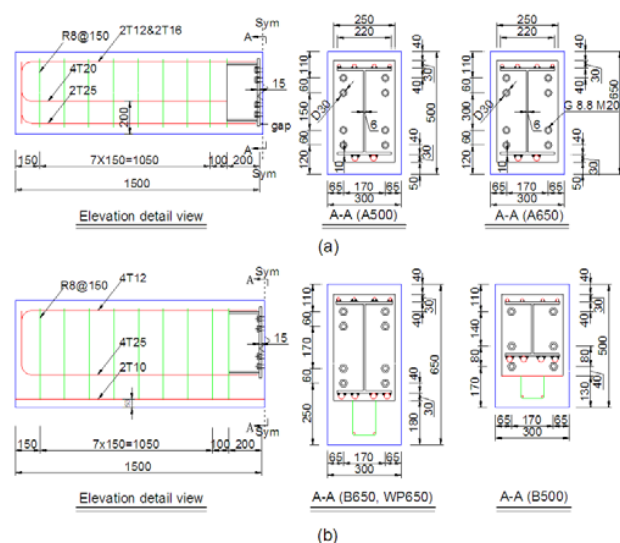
Detail of the specimens and the proposed DfD beam-column connections (unit mm)
